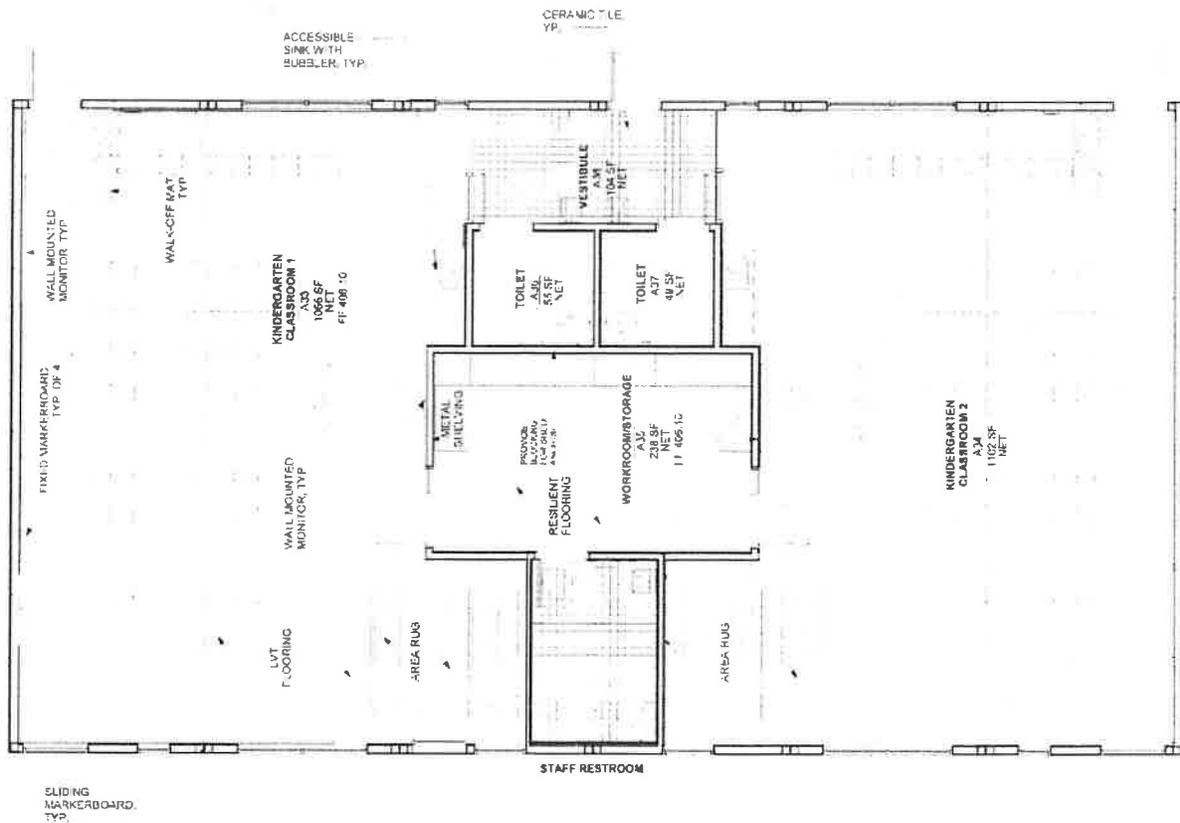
Drifill Elementary Proposed Locations of New Preschool, TK, and K Classrooms
